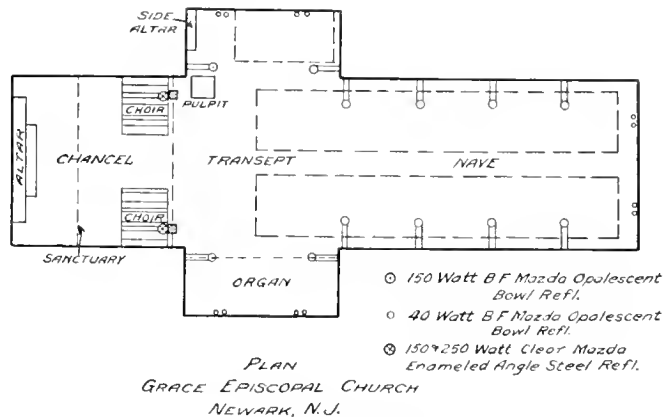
Floor Plan of a Lighting Layout for a Church Built on Gothic Lines
